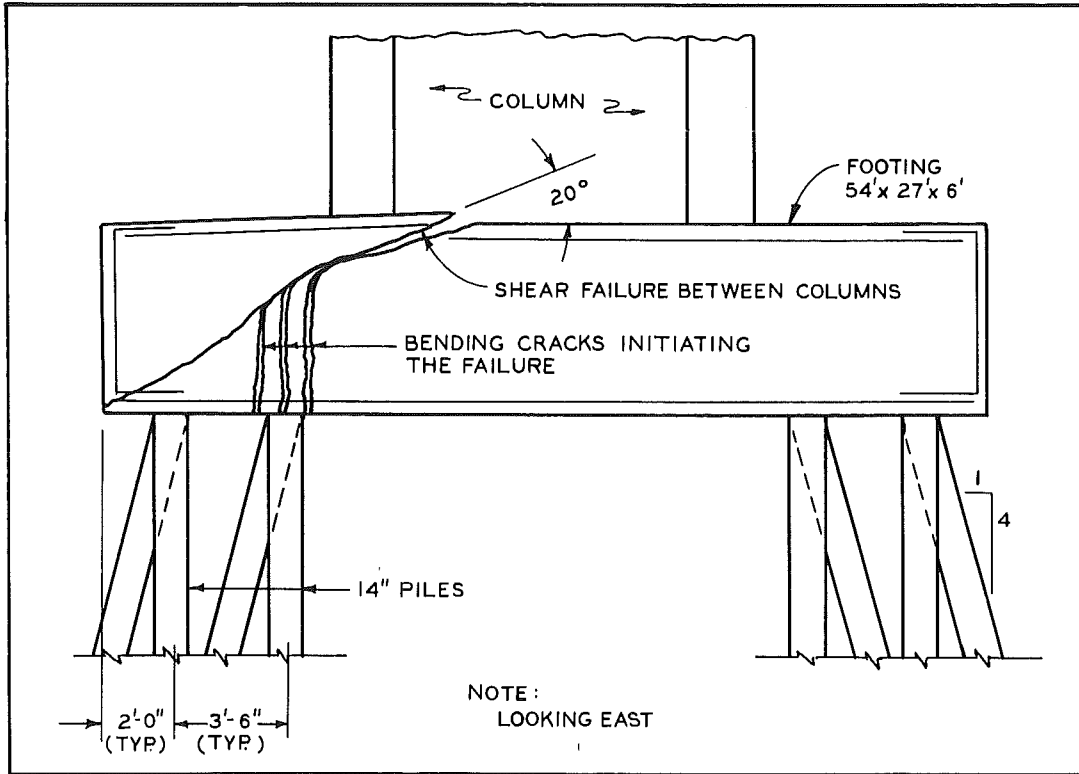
Diagram showing damage to footing of pier 11.
